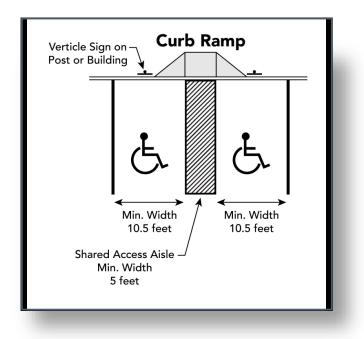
Accessible Parking Stall and Walk Aisleway Dimensions
